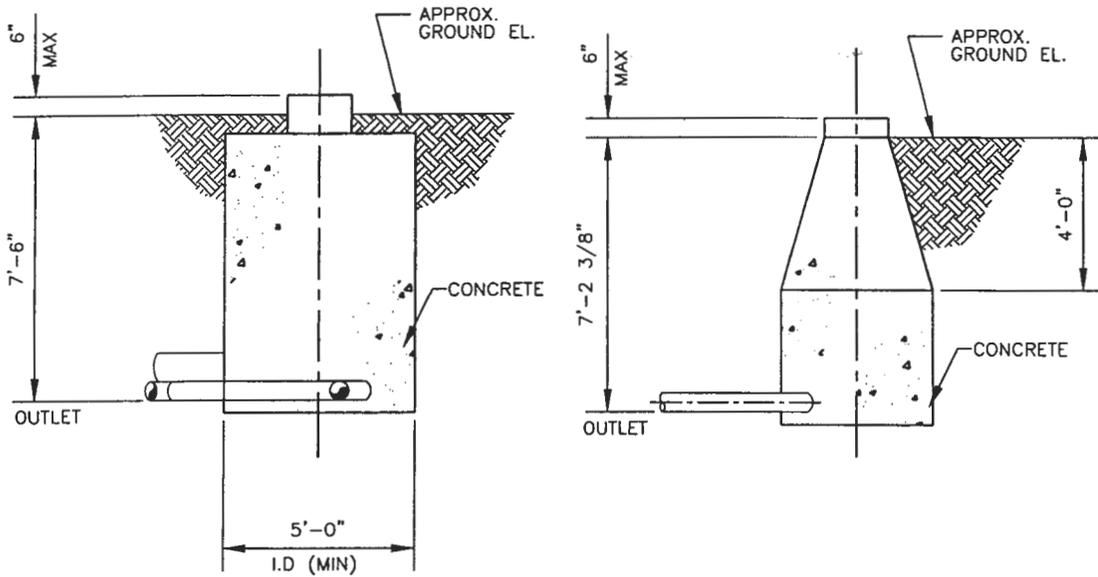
Typical Section Views of Manholes in Z-Ditch Pipelines.
